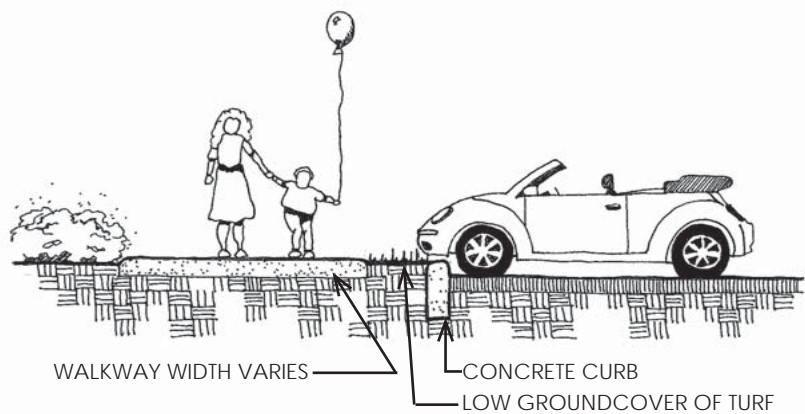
Parking Lot Curb - 6" Curb Adjacent Planted Area
